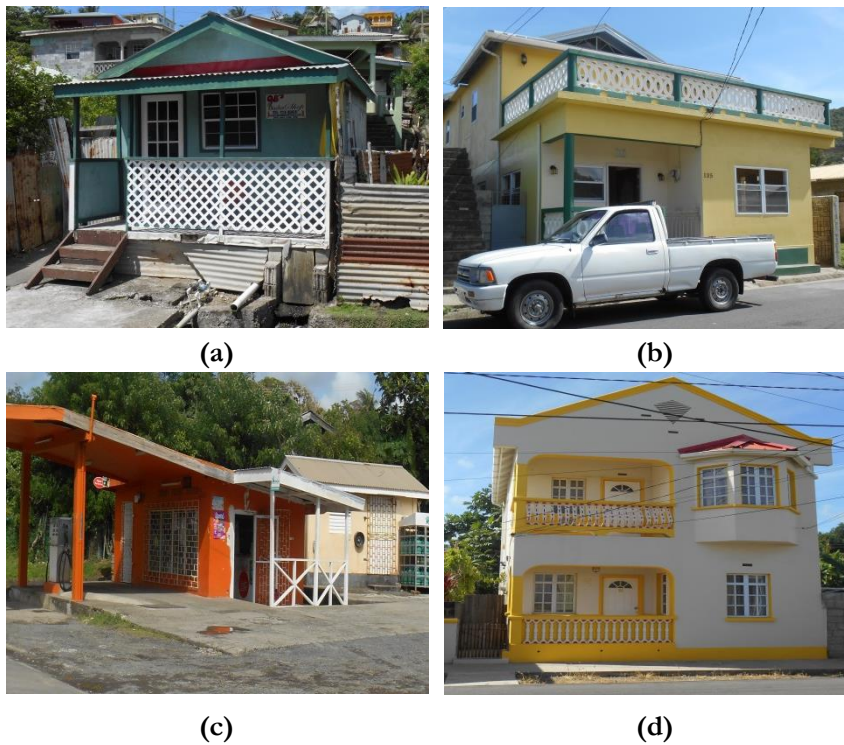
Common structural types of buildings from interviewed household (a) Structural type 1 (b) Structural type 2 (c) Structural type 3 (d) Structural type 4
